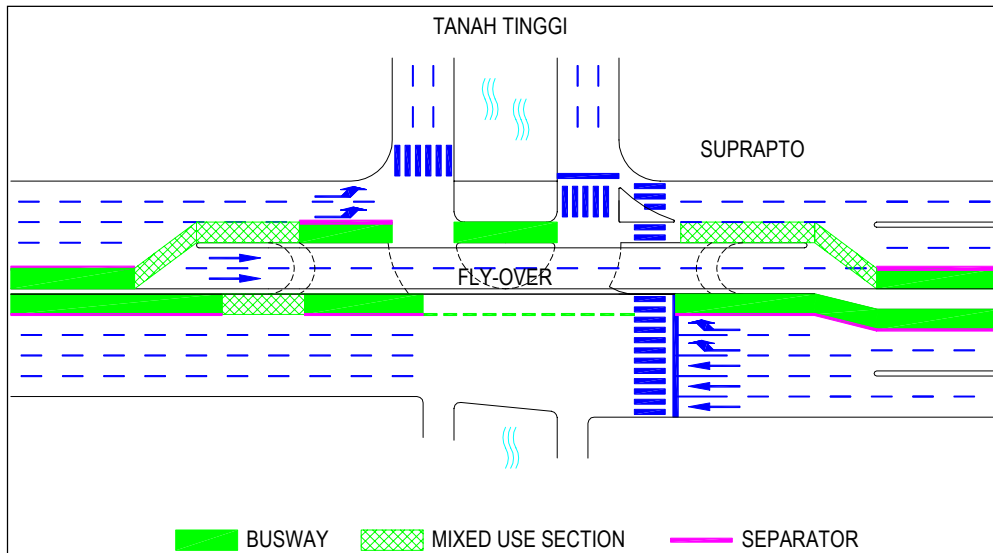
New Layout at Suprapto – Tanah Tinggi Intersection
